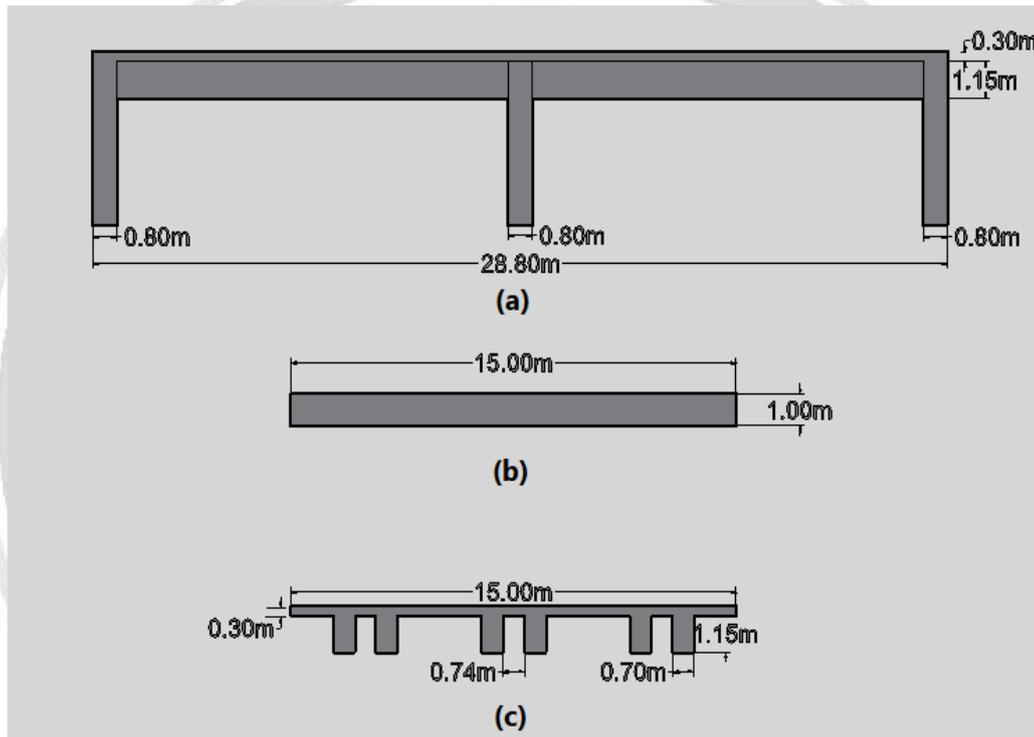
the bridges cross-sections: (a)side view of ribbed slab bridge, (b)rectangular section, (c)ribbed slab section
